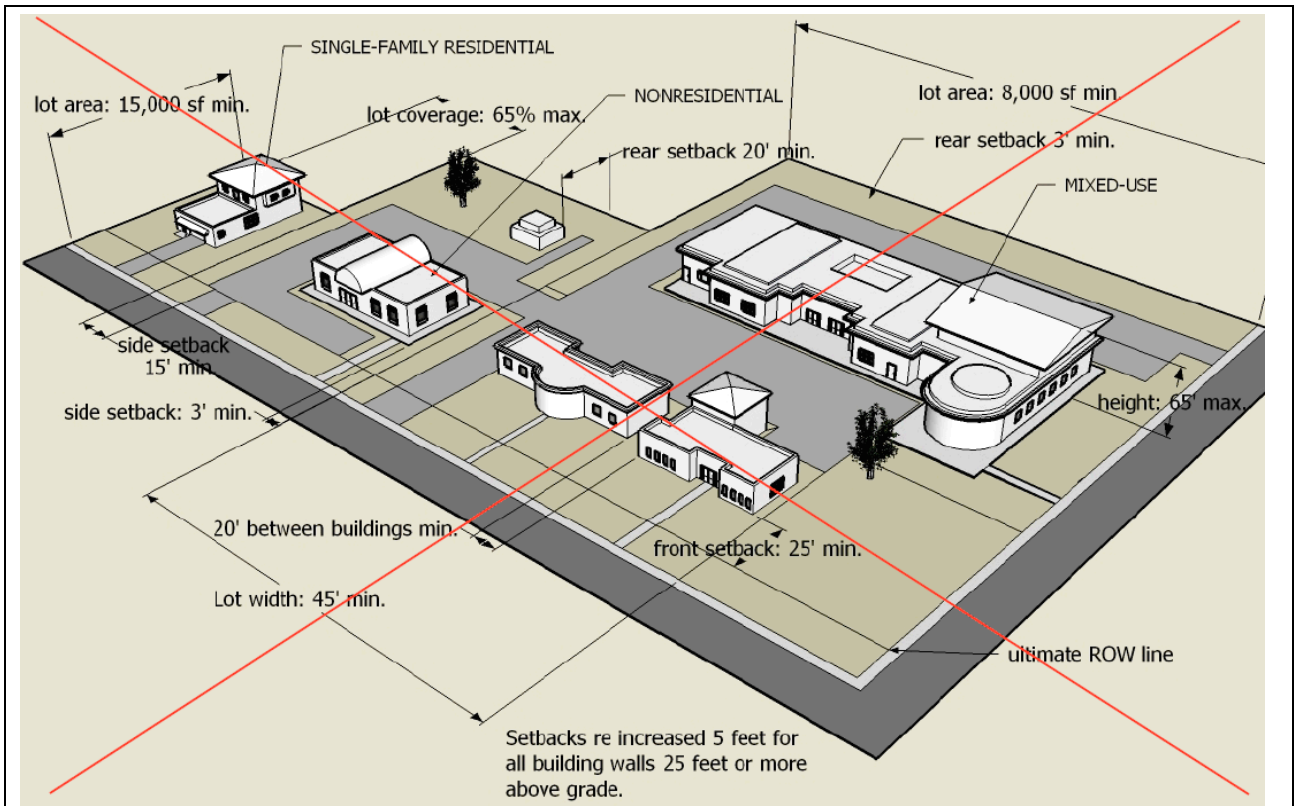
eE.5.c: CC Typical Building/Lot Configuration
